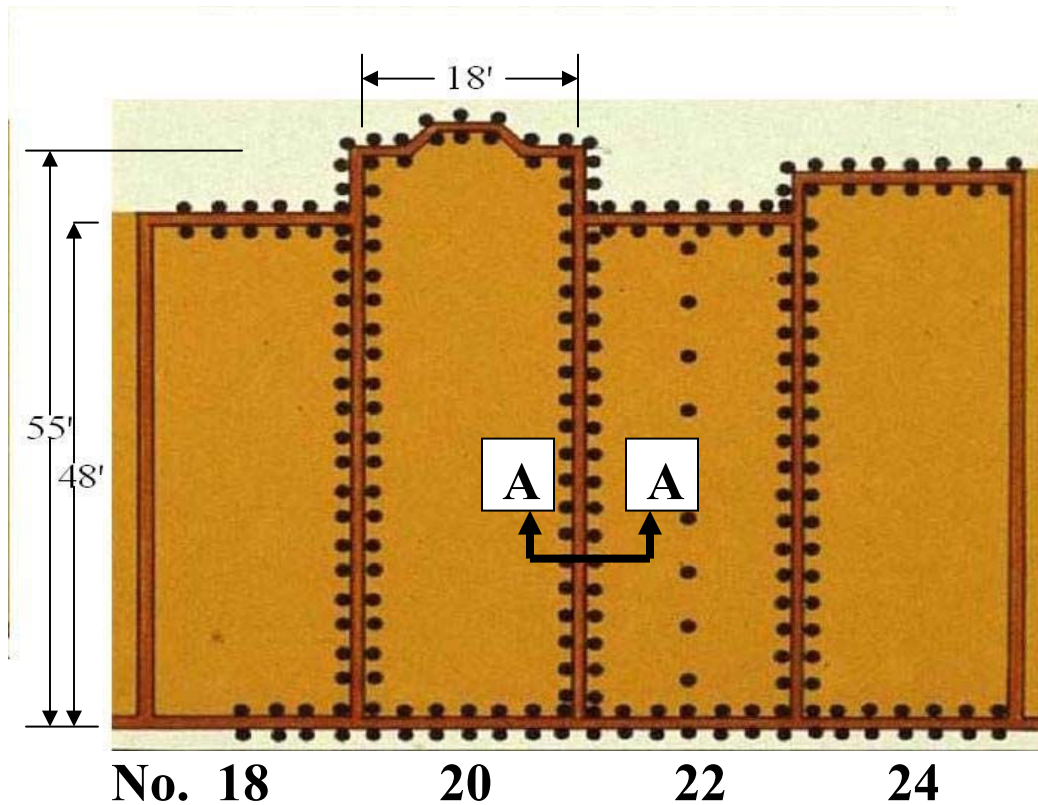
Plan of Typical Arrangement of Wood Piles beneath Rowhouse Wall
